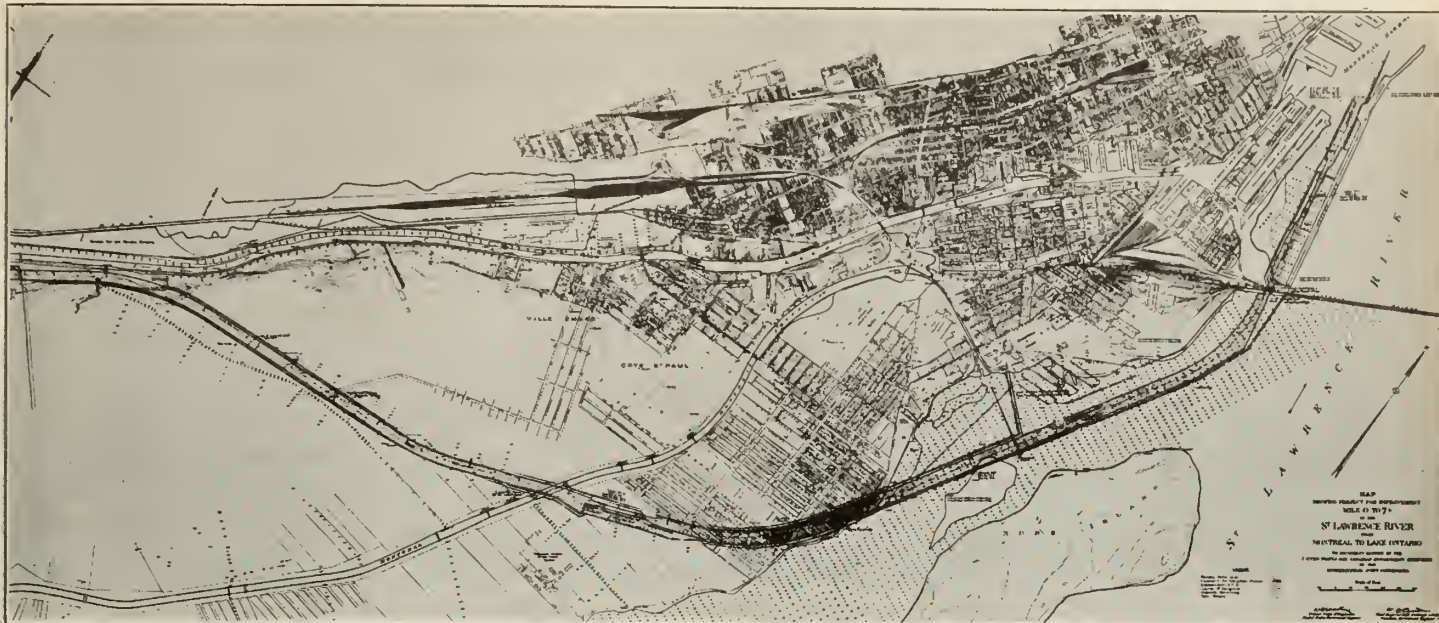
Official Plan St. Lawrence River Improvement Project, Mile 0 to 7.
